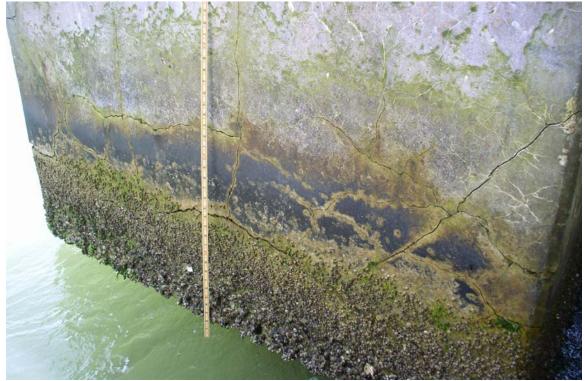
CRACKING IN NORTH END OF EAST "NEW" CAP AT BENT 189 EXTENDING ABOVE THE TIDAL ZONE
